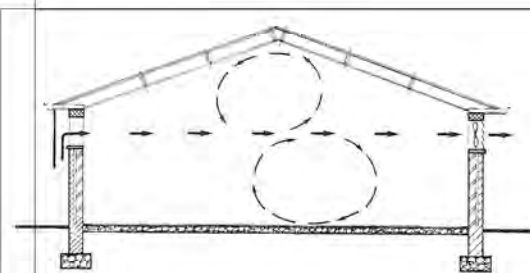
The air movement with fans in one side wall (cross ventilation)
